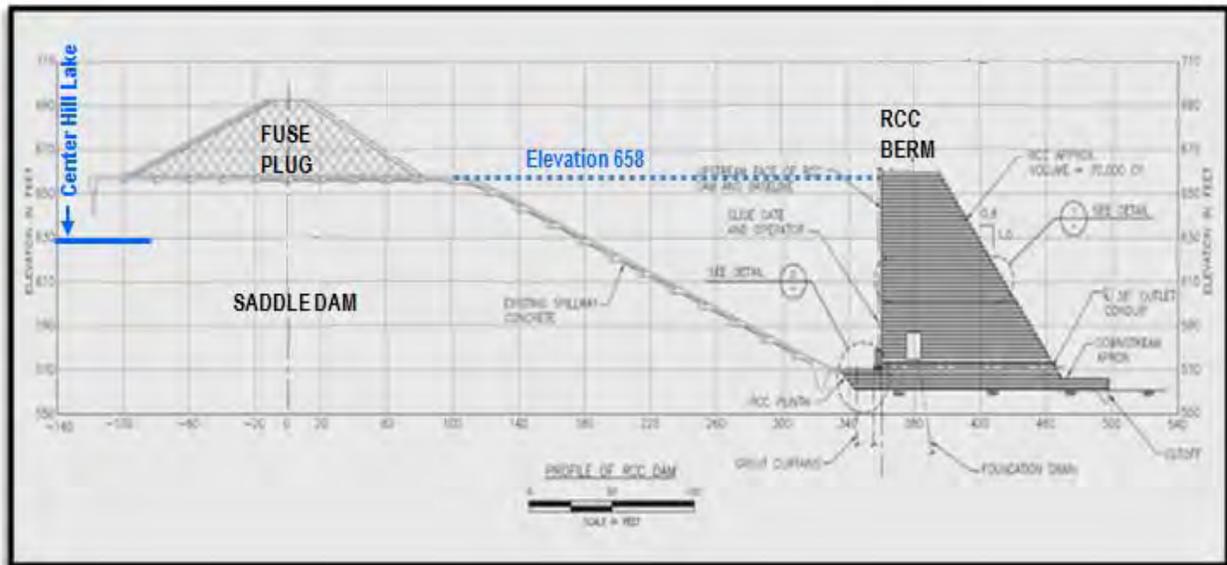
Conceptual Design – Cross-section of the Saddle Dam and RCC Berm Alternative.
